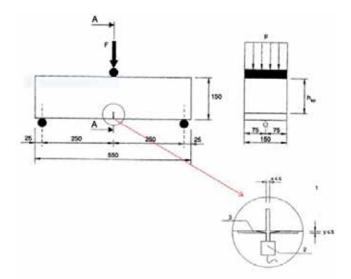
EN 14651 Notched Beam Test for determining Structural Design Values
